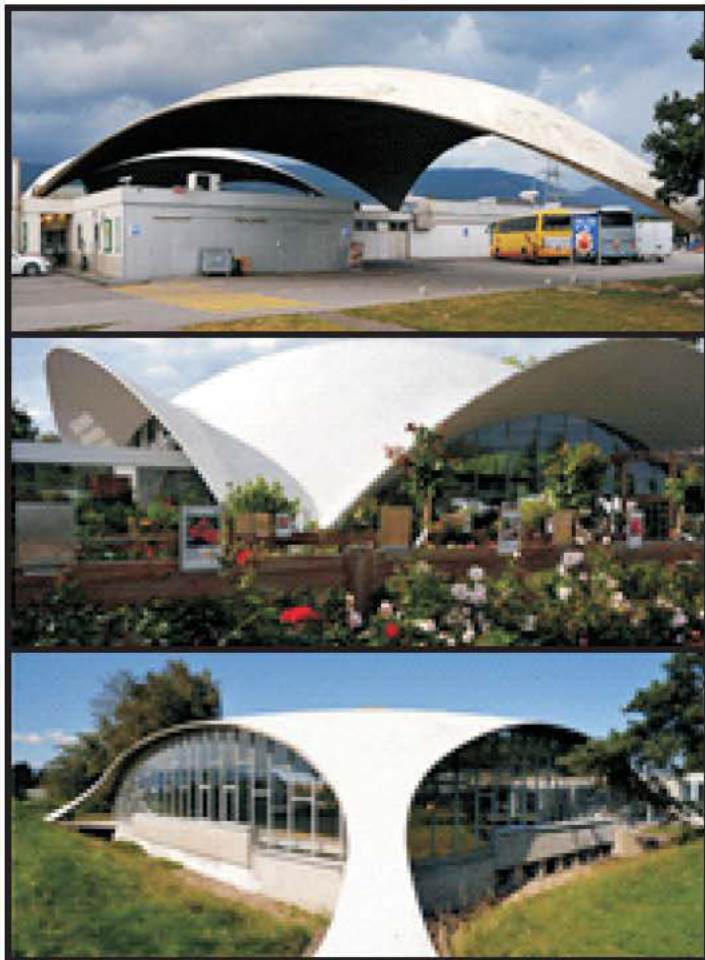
Aesthetic shells by Heinz Isler (a) filling station roof at Deitingen, near Bern, (b) Concrete shell roof of the garden center Wyss in Zuchwil, and (c) Dome over the building in Rechterswil (source: <http://en.wikipedia.org/>)
